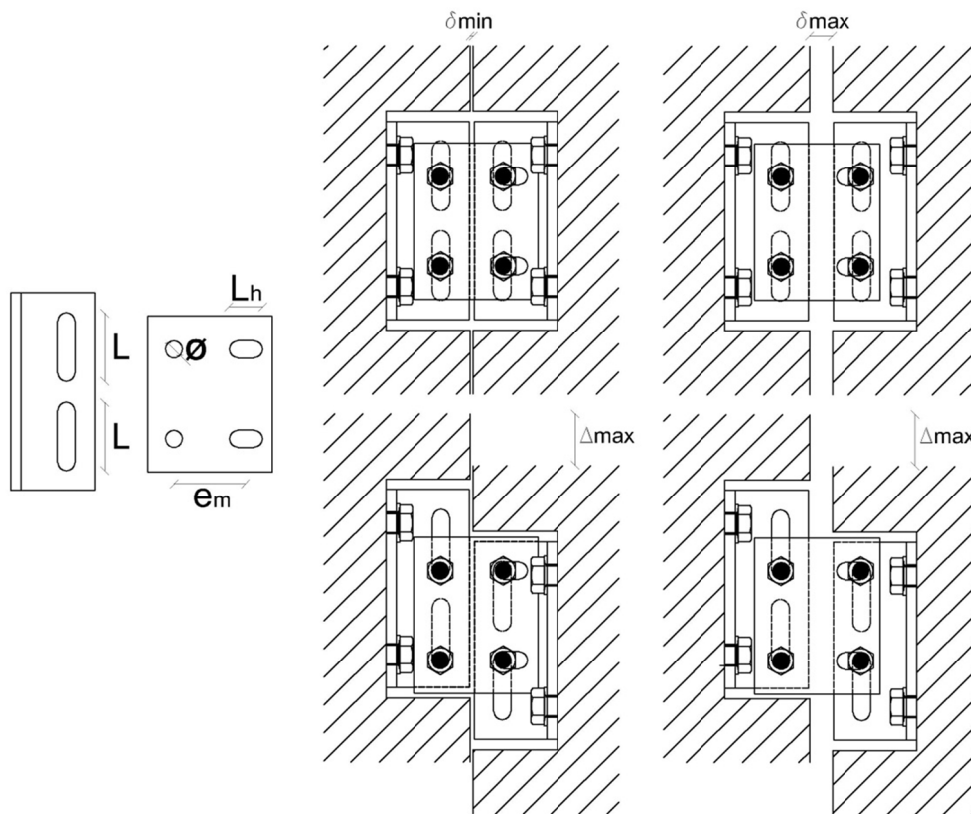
Assemblage tolerances and maximum relative sliding
